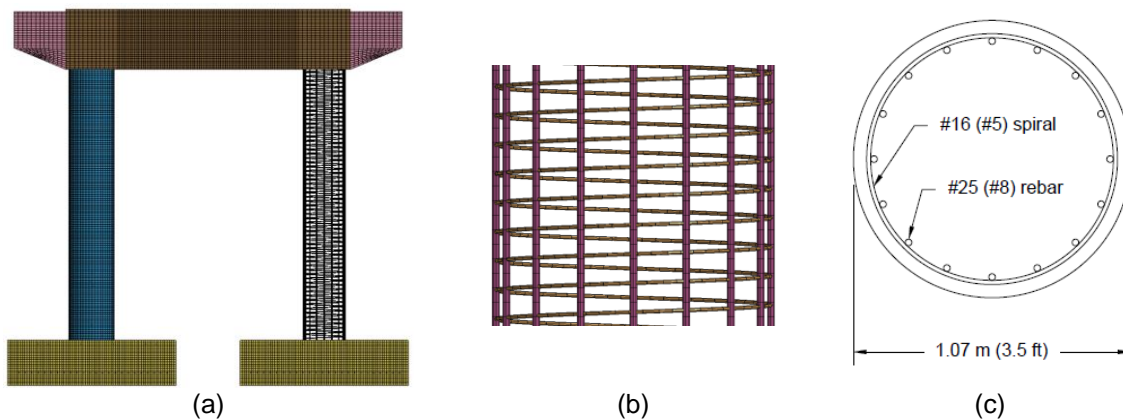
Details of the frame pier's columns: (a) side view, (b) close-up of steel reinforcement in the column, and (c) column cross-section
